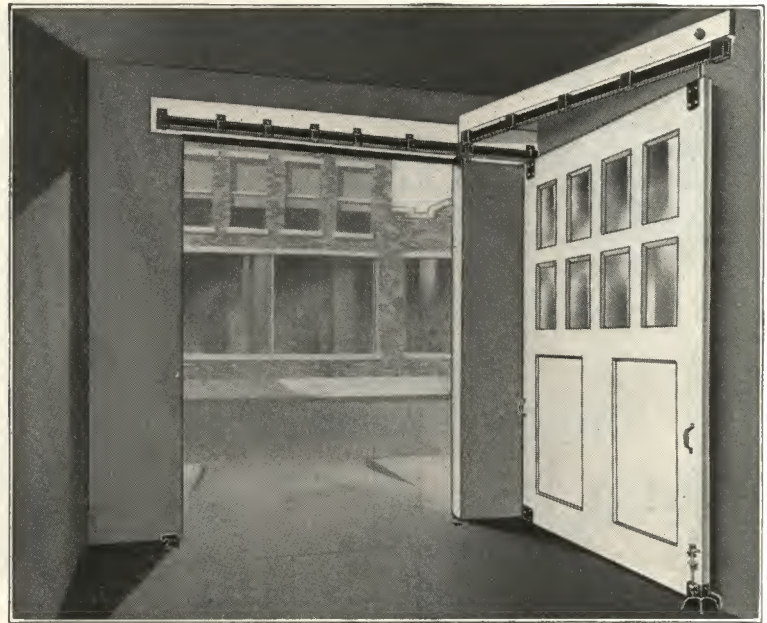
Interior View. Door Wide Open and Parallel with Side Wall
